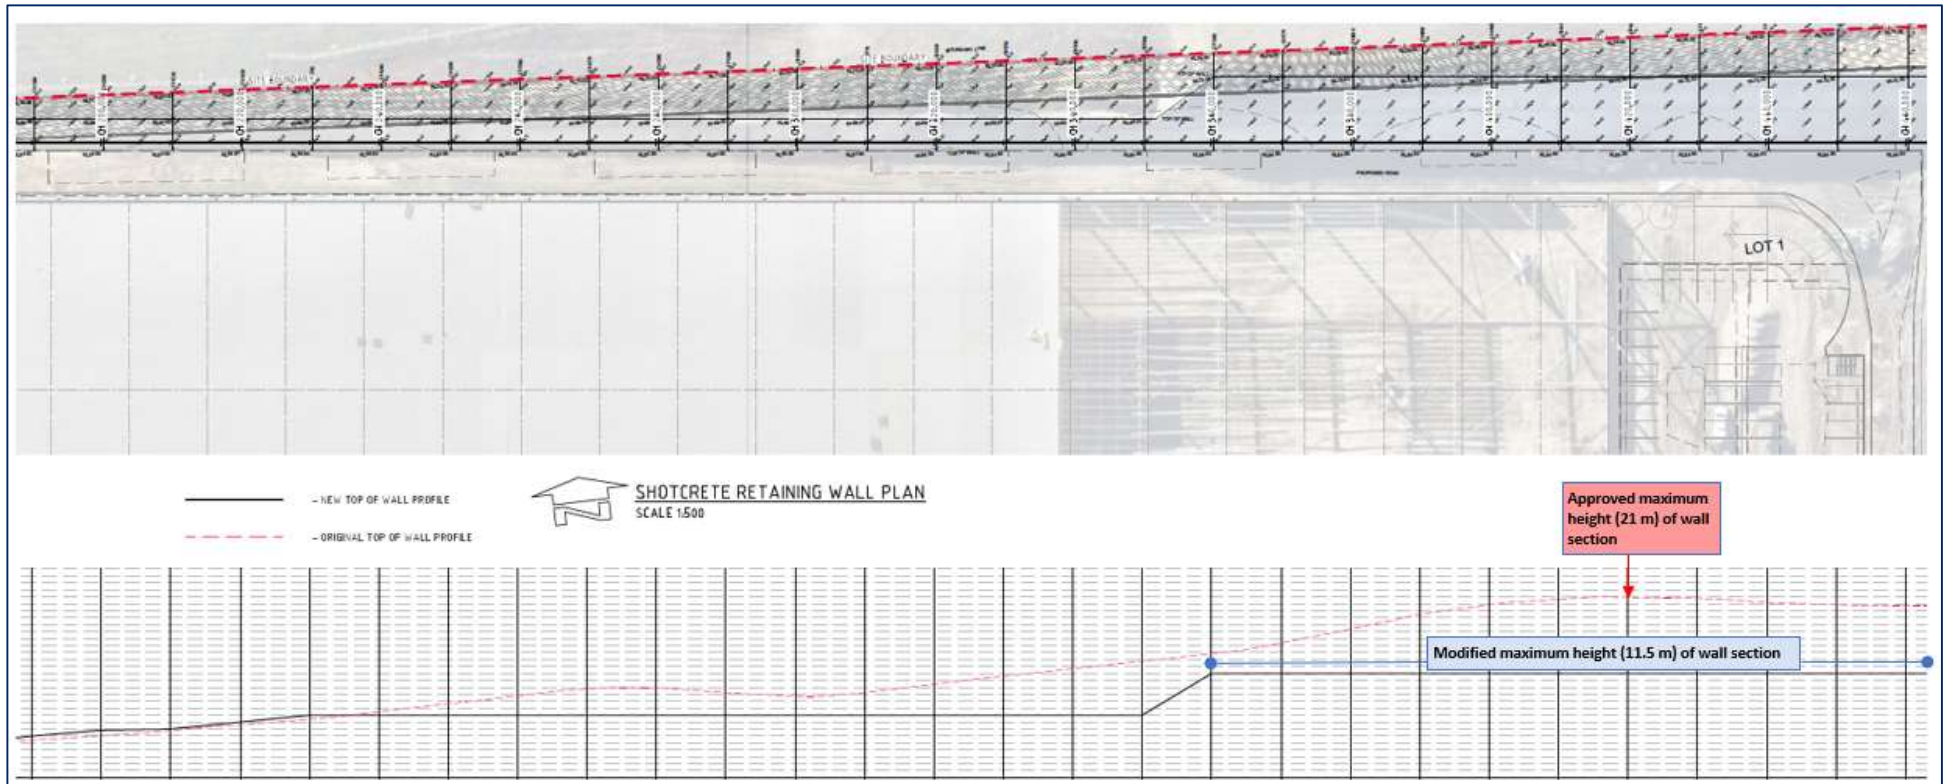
| Northern boundary retaining wall comparison between SSD-9138102 approval and proposed modification
